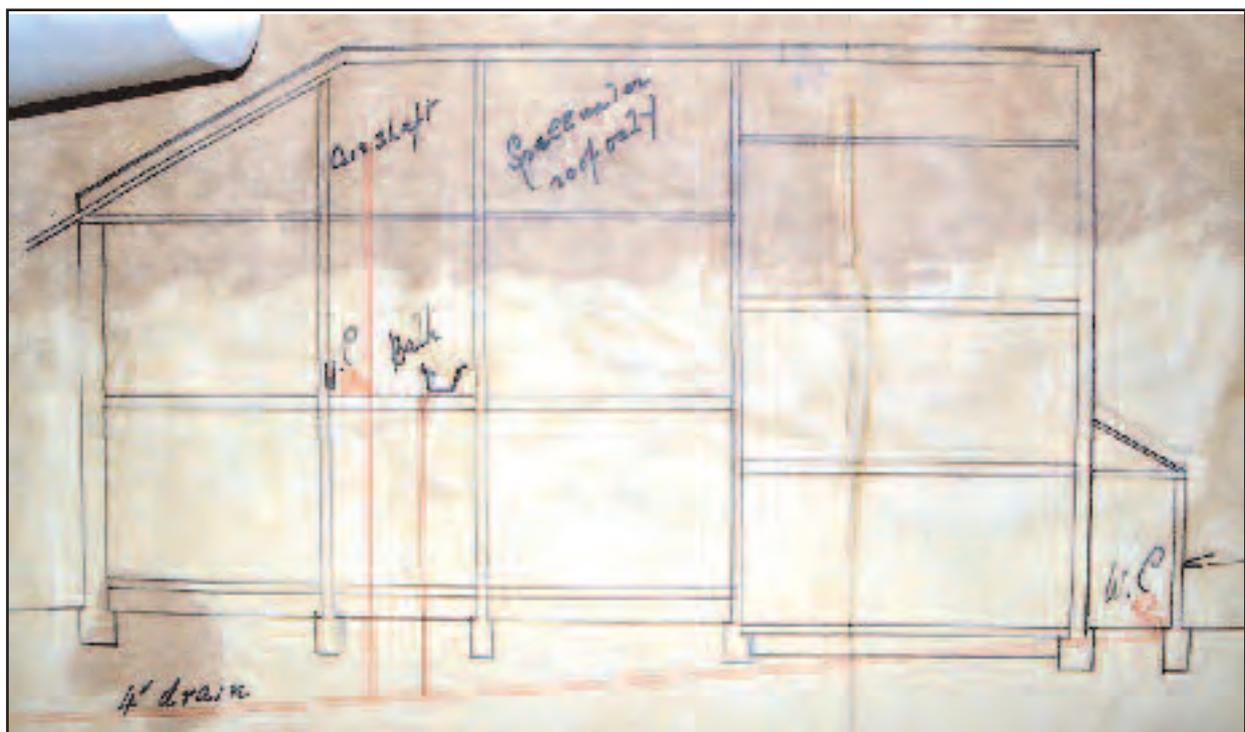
Section through house, 17-27 Tyndall Avenue, 1903
